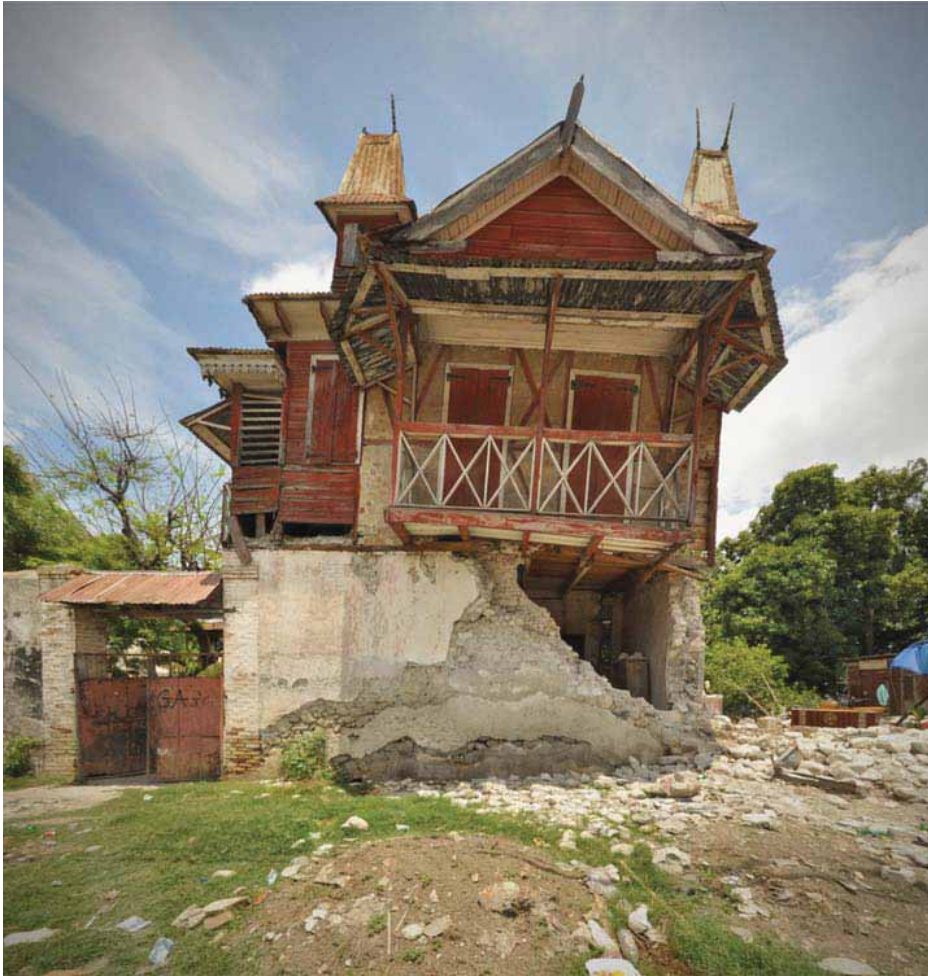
House in Léogâne where the solid rubble stone wall on one side partially collapsed, while the side with the two door openings with brick piers and rubble panels seen through the collapse remained standing with much less damage.
